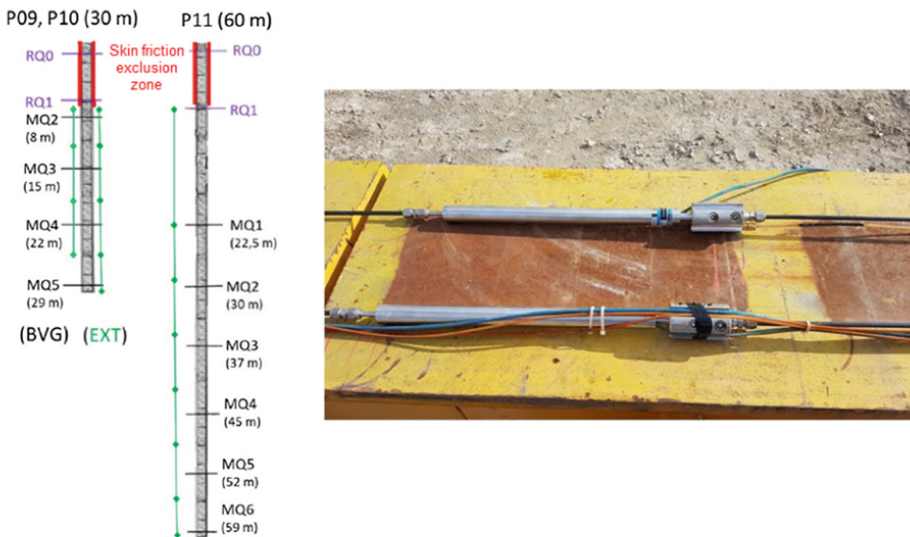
Instrumentation of the test piles – left: locations of the instrumented cross sections with strain gages (BVG); and right: retrievable extensometer (EXT) with pneumatically expandable anchors and vibrating wire strain gauges.
